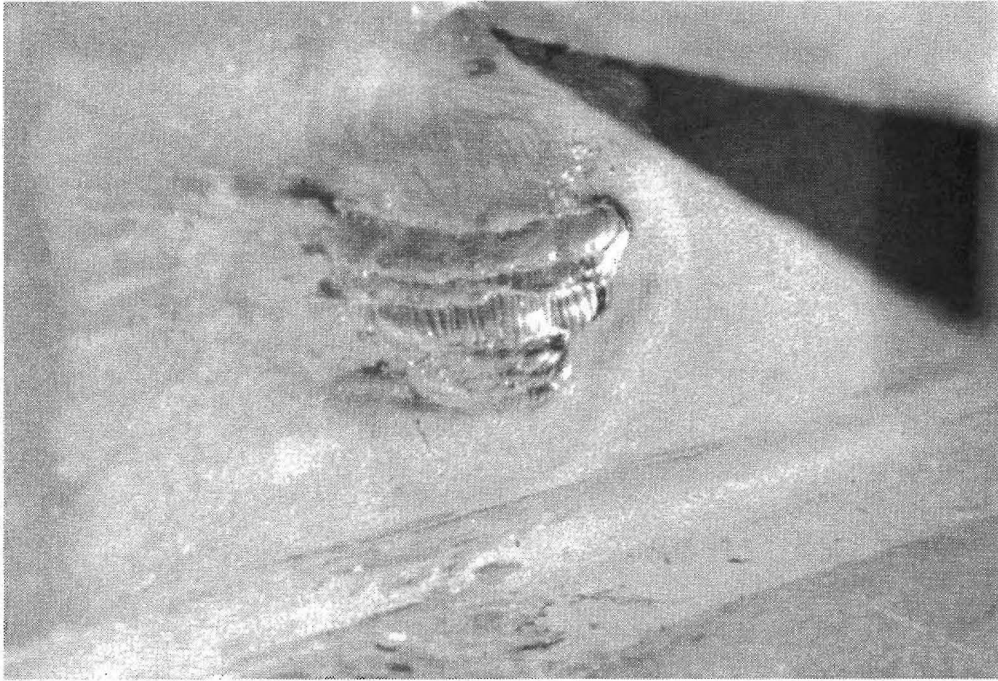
View of back gouged fatigue crack lines.
